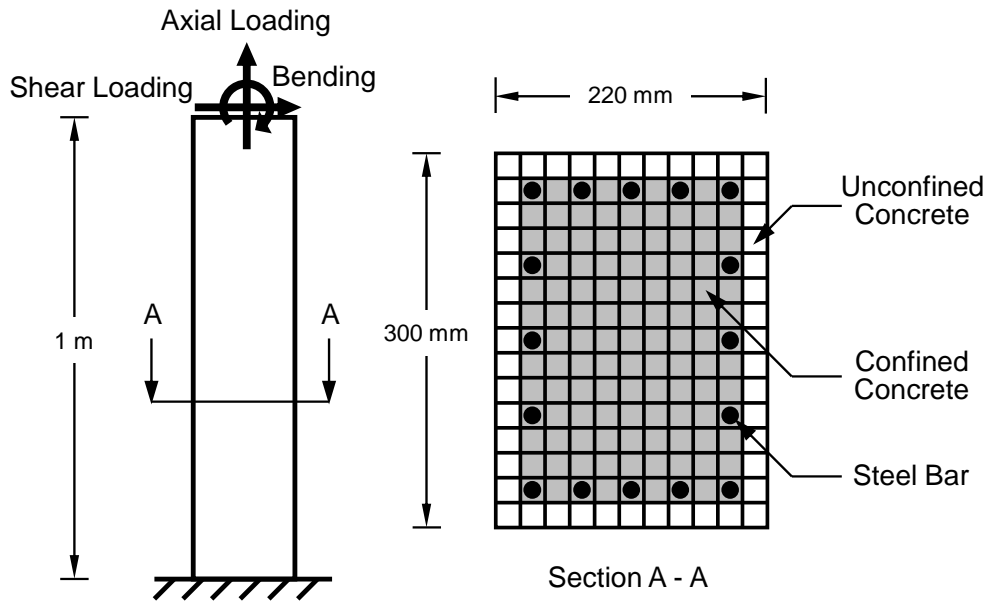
Schematic of the reinforced concrete column modeled with fiber sections and uniaxial steel/concrete materials.
